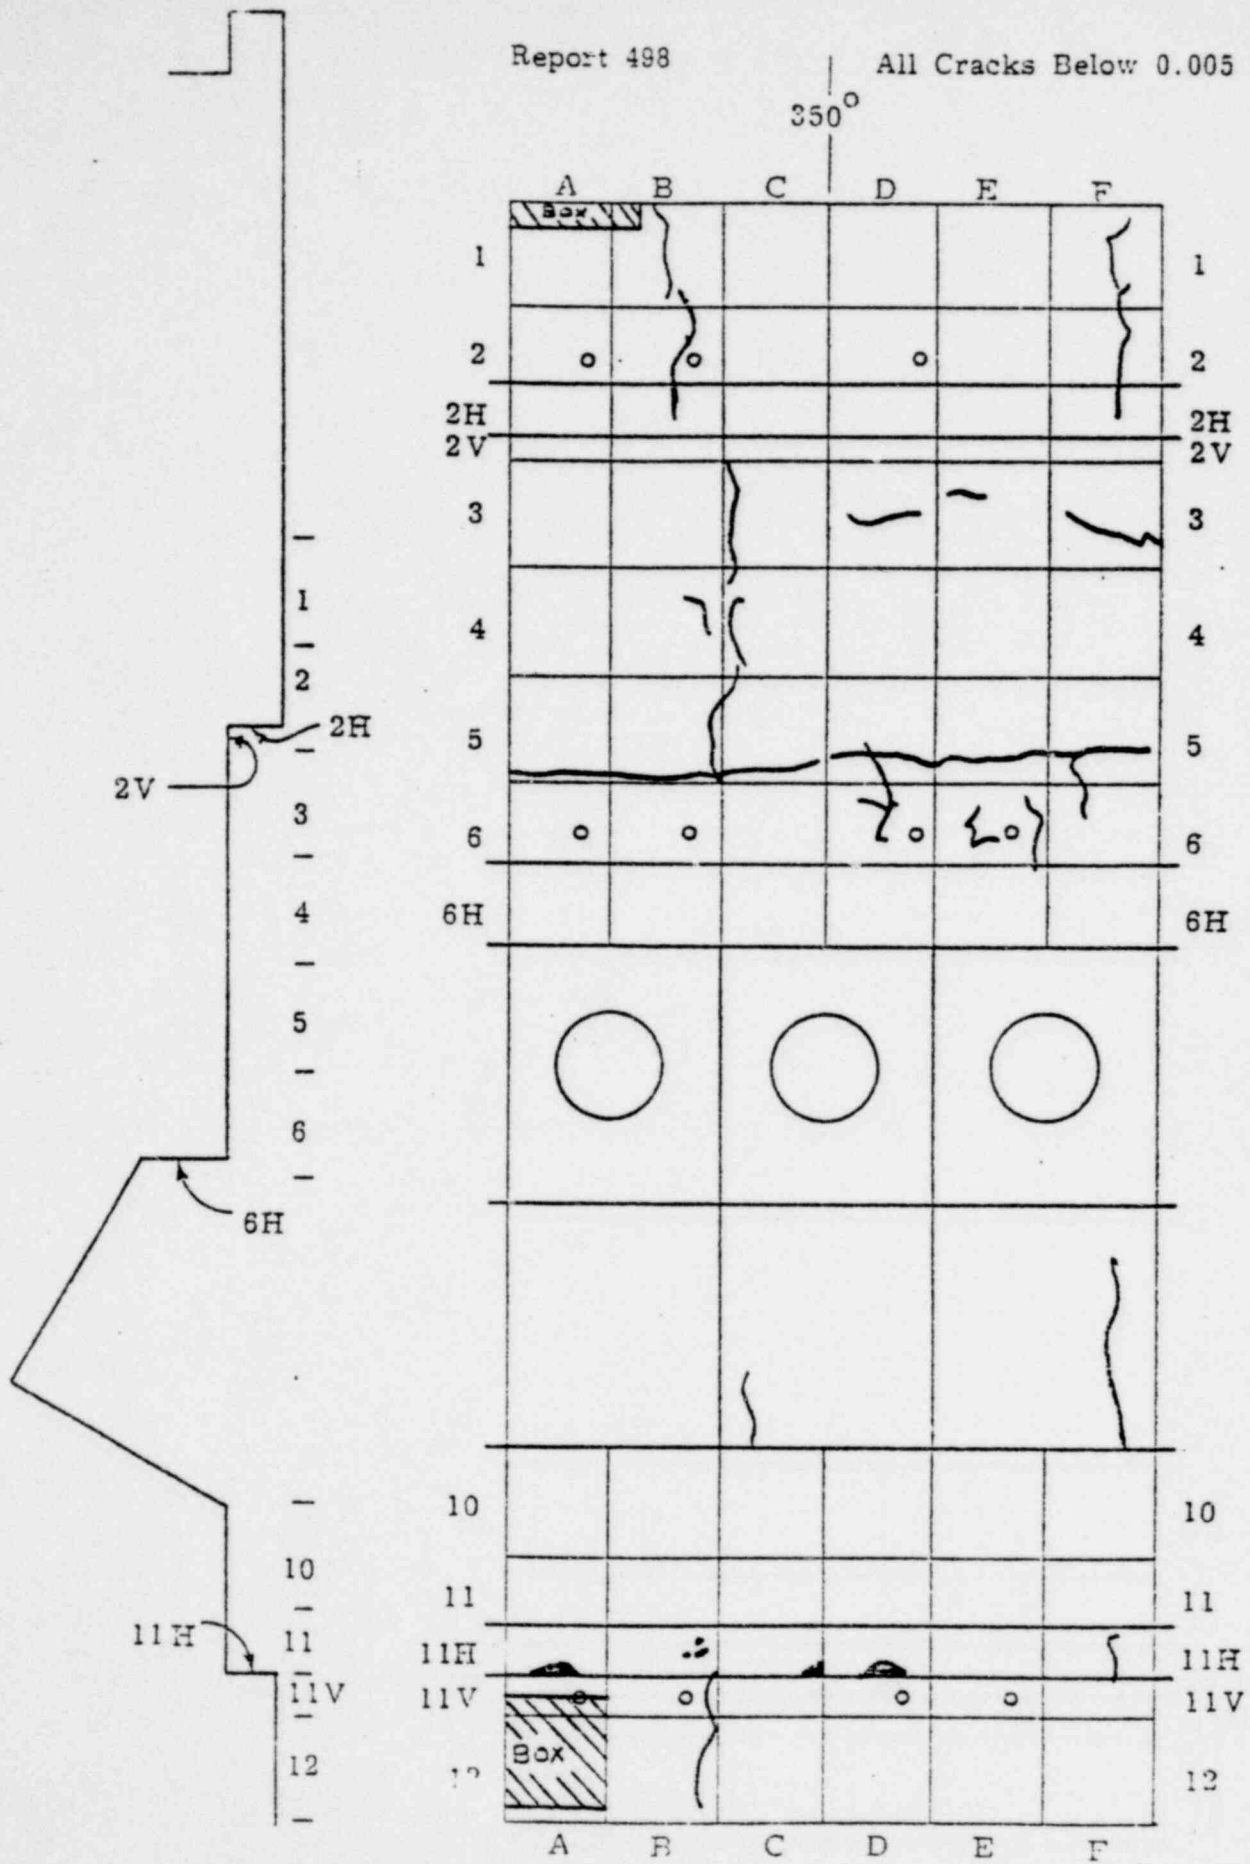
CRACK PATTERN AT AZIMUTH 350° AFTER FULL PRESTRESS, SEPTEMBER 19, 1973.
